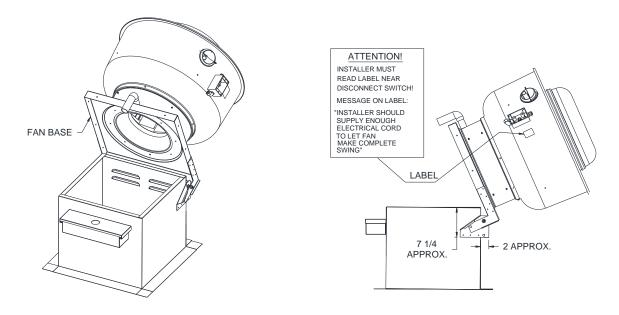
Centrifugal Up-blast Hinge Kit Installation Details
